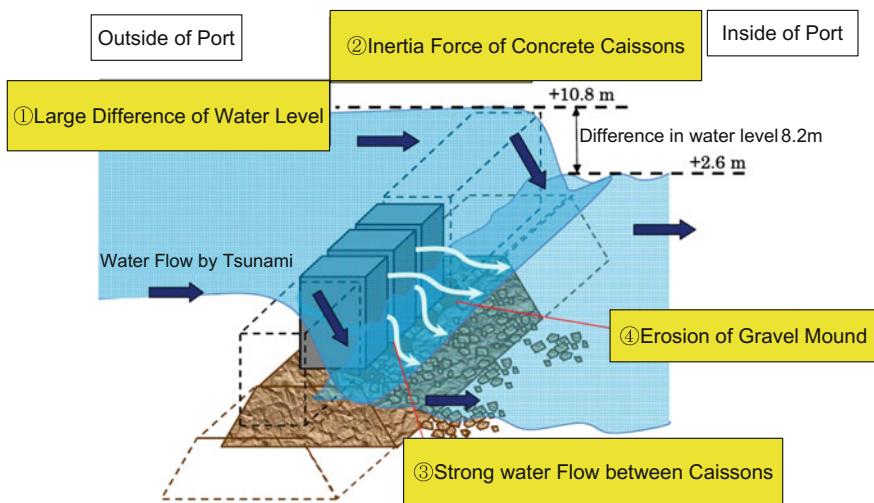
Structure of the collapsed breakwater at Kamaishi Bay [5]
